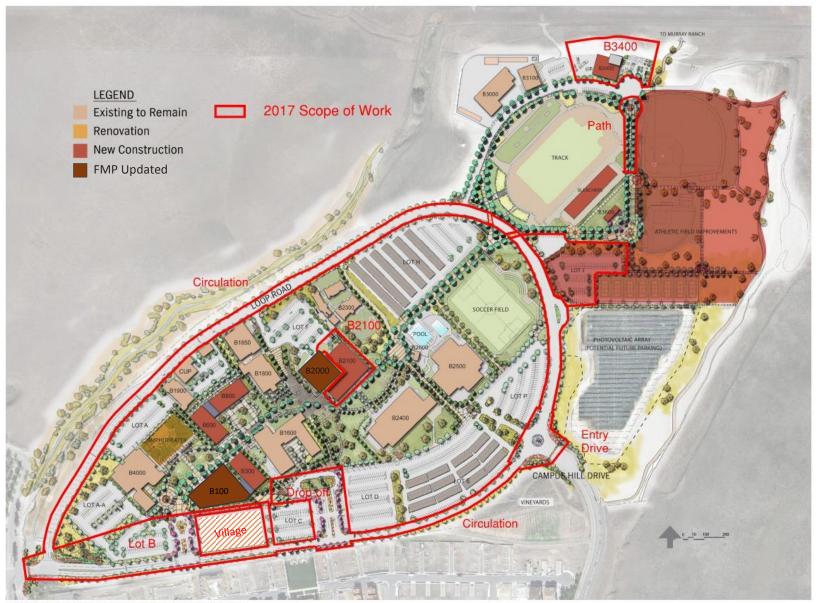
Las Positas College 2012 Facilities Master Plan
